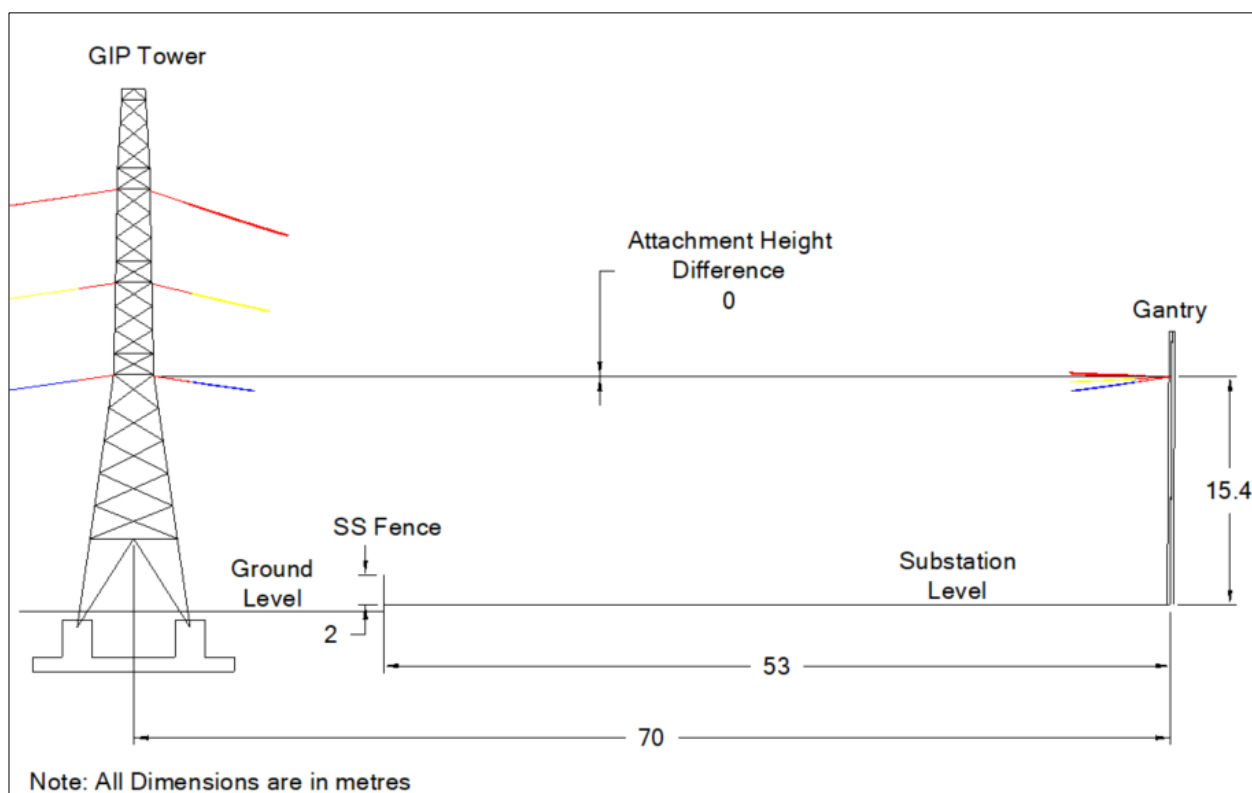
Initial Setup of GIP Connection with 2DD-HST Tower
